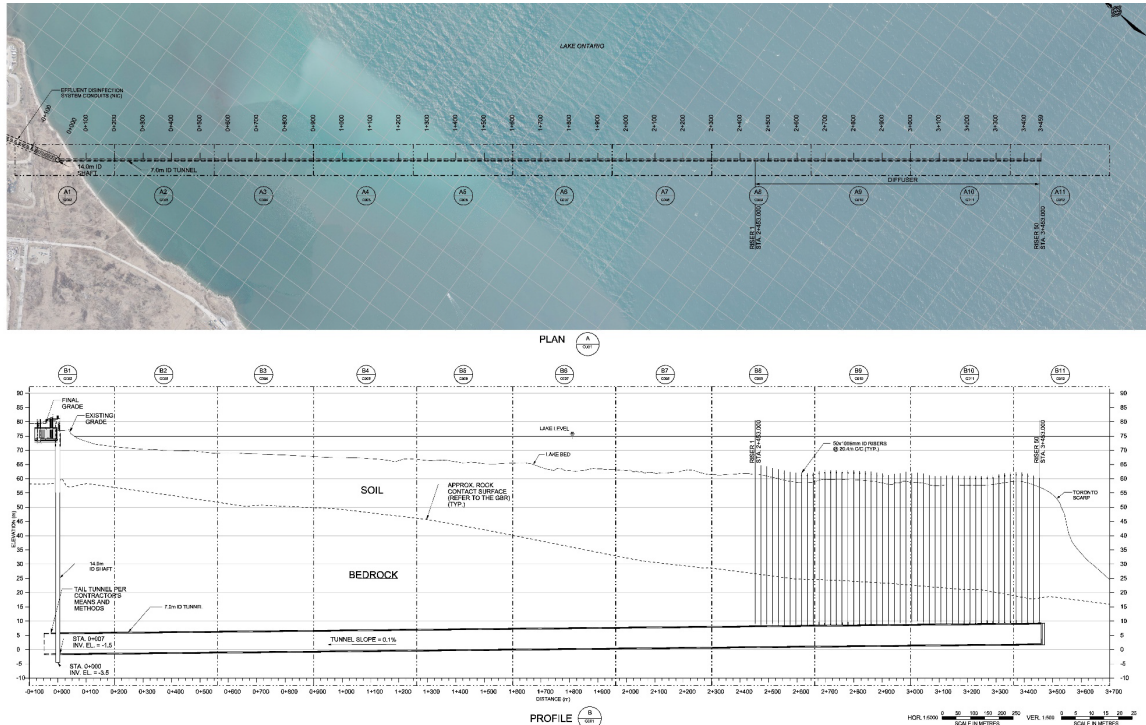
Ashbridges Bay Outfall profile – running tunnel and diffuser shafts at end of tunnel drive
